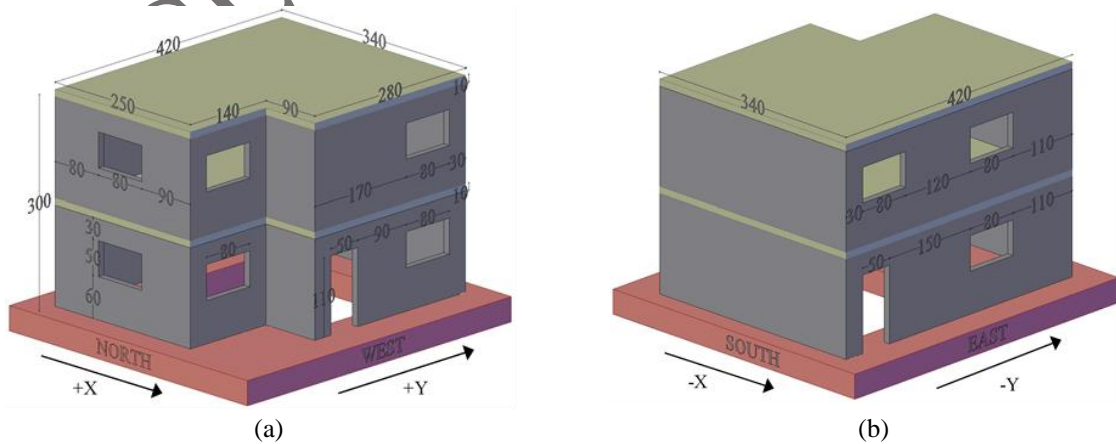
The structural configuration of the URM building, (a) north-west façade, (b) south-east façade [16]
